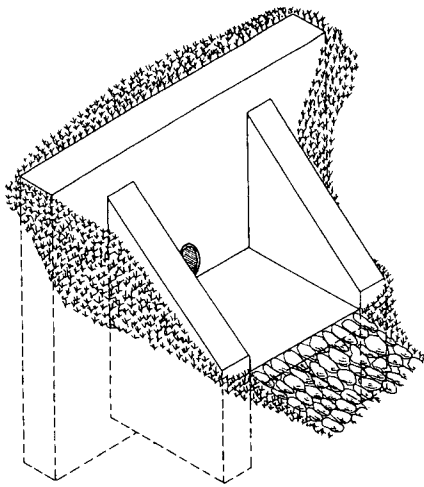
A good type of concrete headwall. The wing walls act as braces. They also prevent banks from sliding and thus blocking the outlet.
